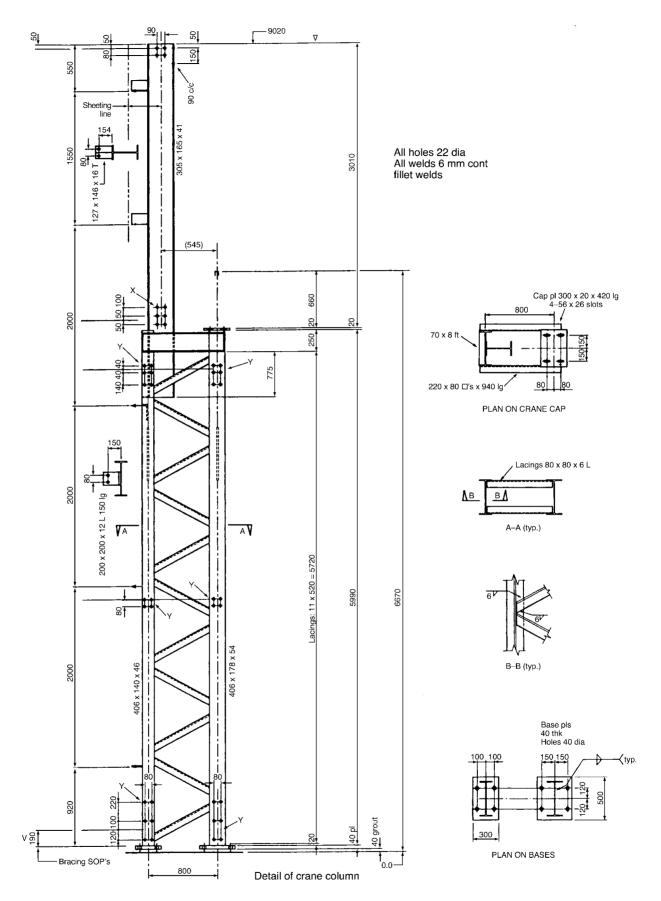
Column detailing practice—trussed column (based on BS 5950 and EC3 specifications)
